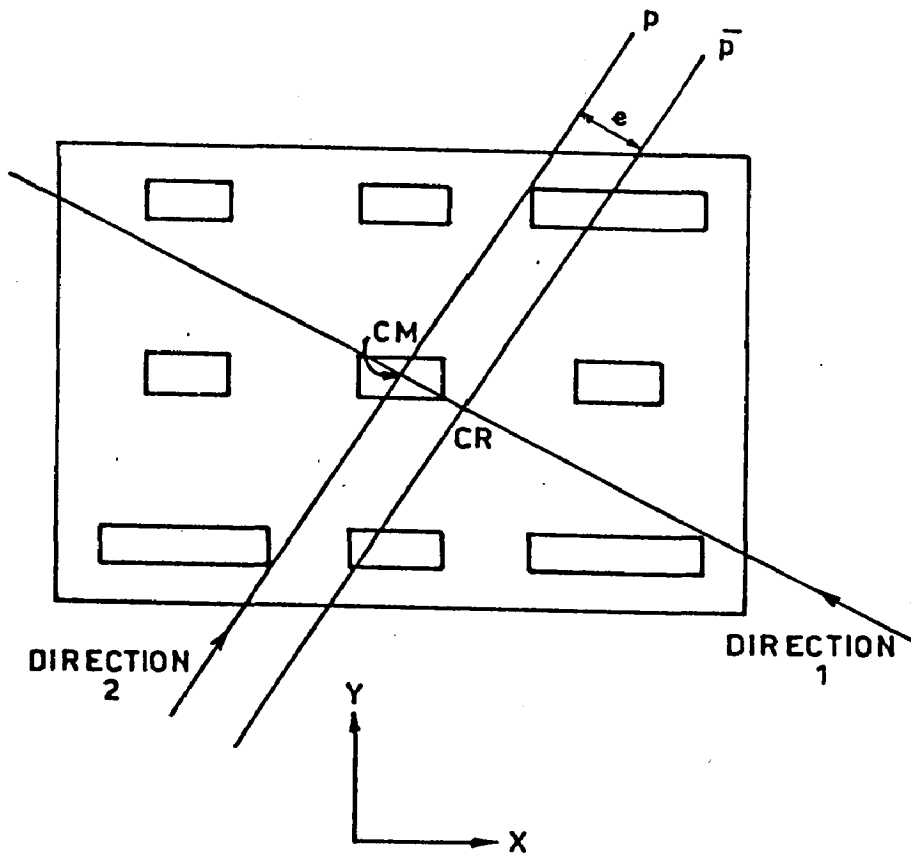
PLAN OF A SINGLE STOREY ASYMMETRIC STRUCTURE
